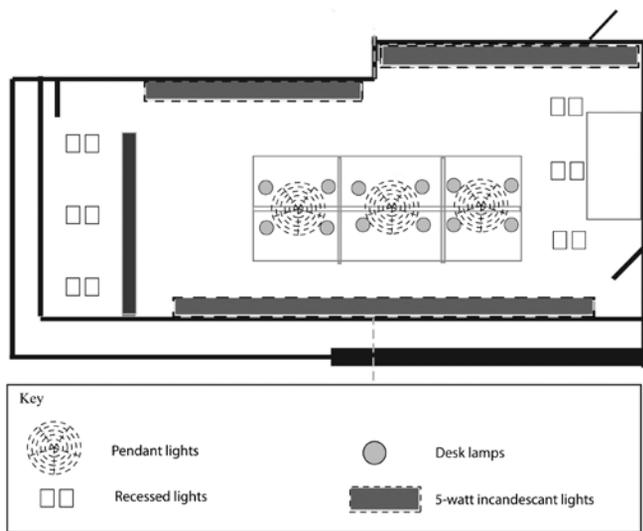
Ahmanson Murphy Reading Room Floor Plan Showing Light Sources
